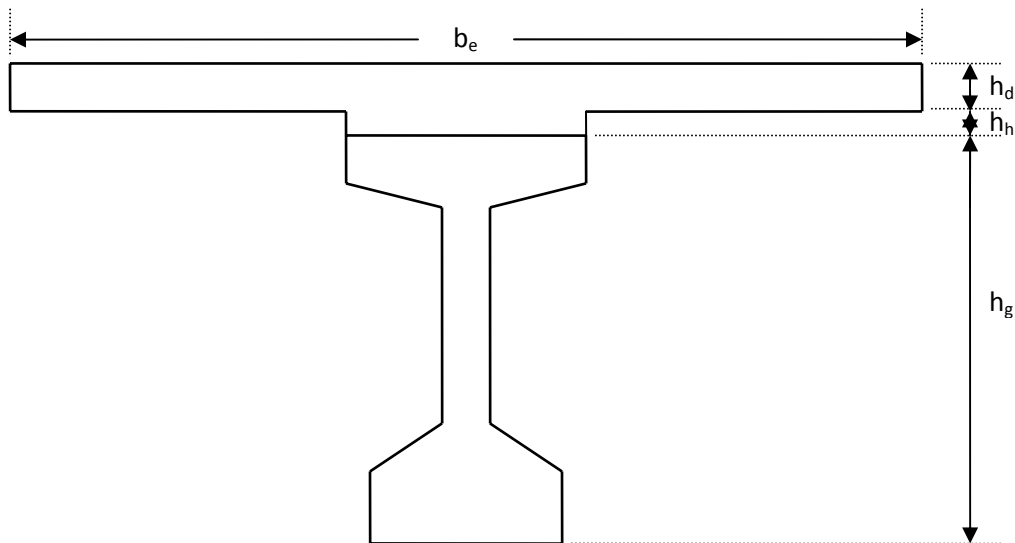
Sketch of PCBT Beam with Deck and Haunch
